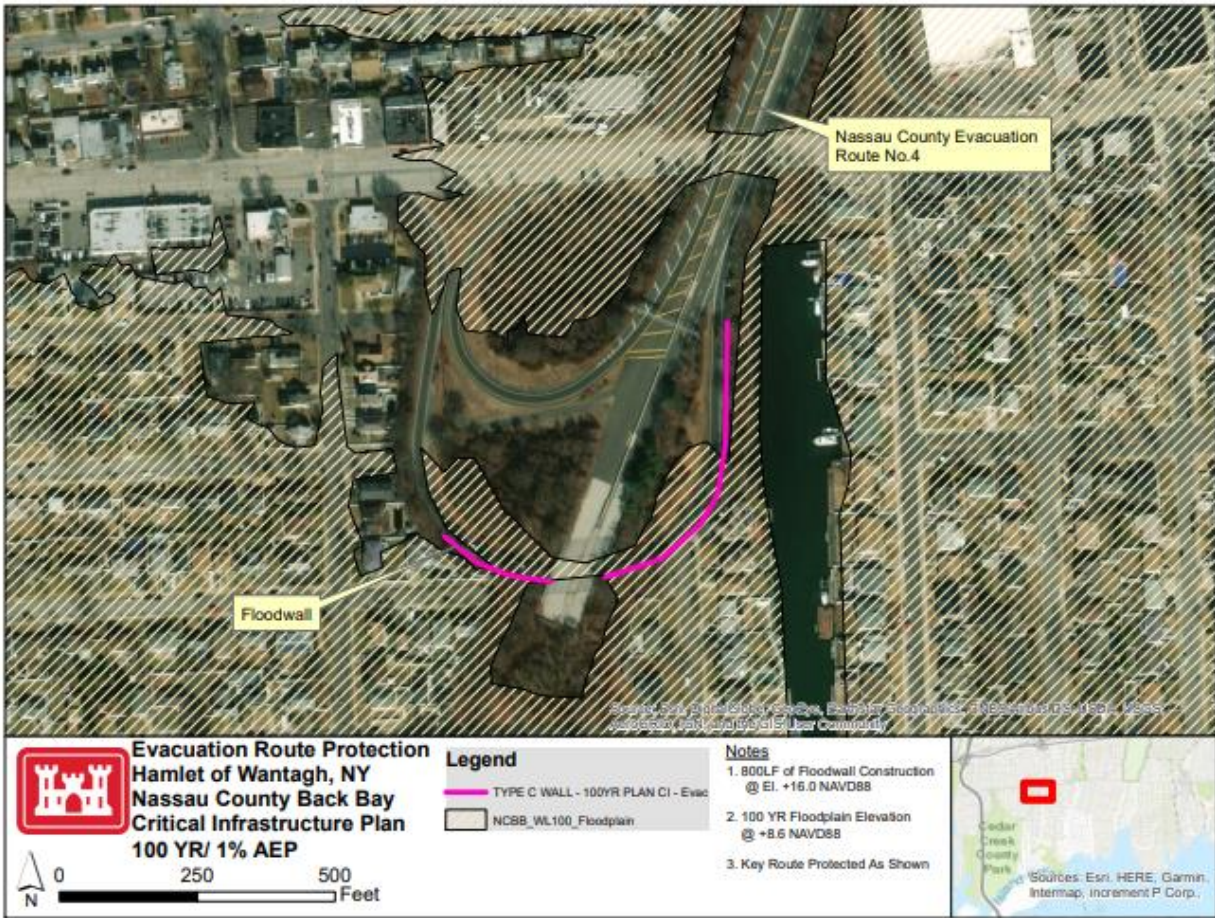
Localized Floodwall for Evacuation Route No. 4
